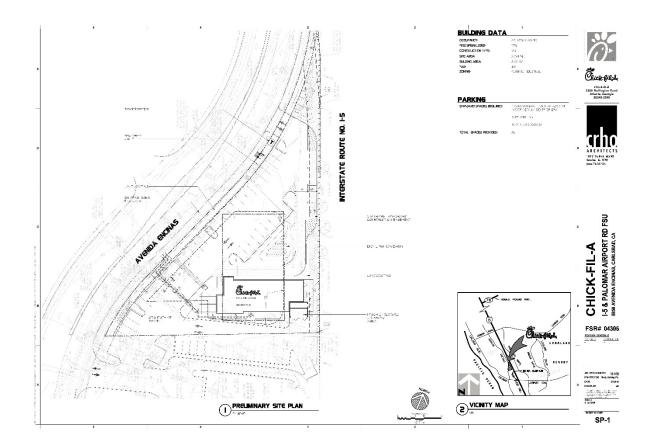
Preliminary Site Plan – Chick-fil-A Carlsbad
